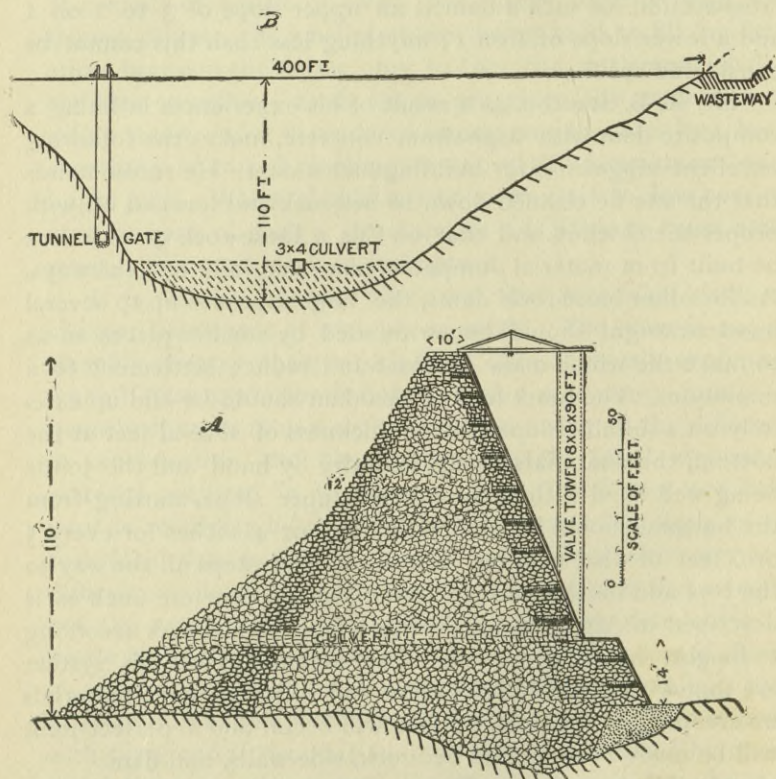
ELEVATION AND CROSS-SECTION OF WALNUT GROVE DAM.
